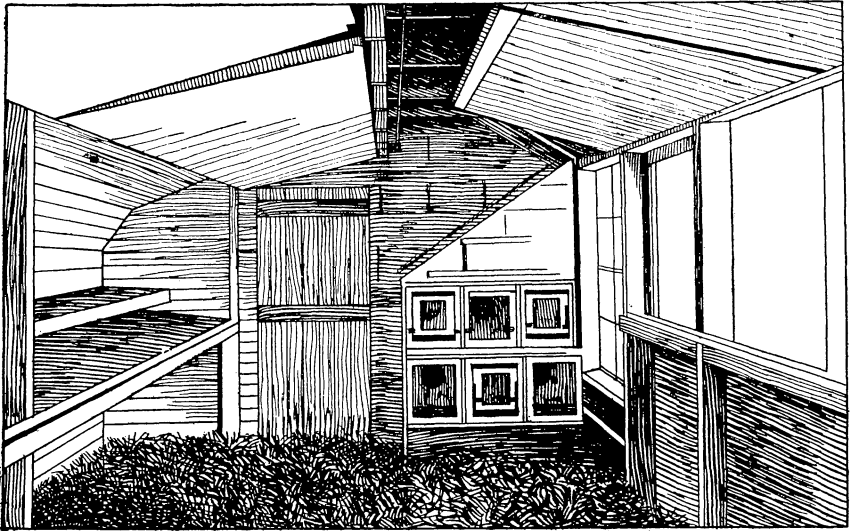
Interior of one section of curtain-front house, showing also trap nests in one corner.
